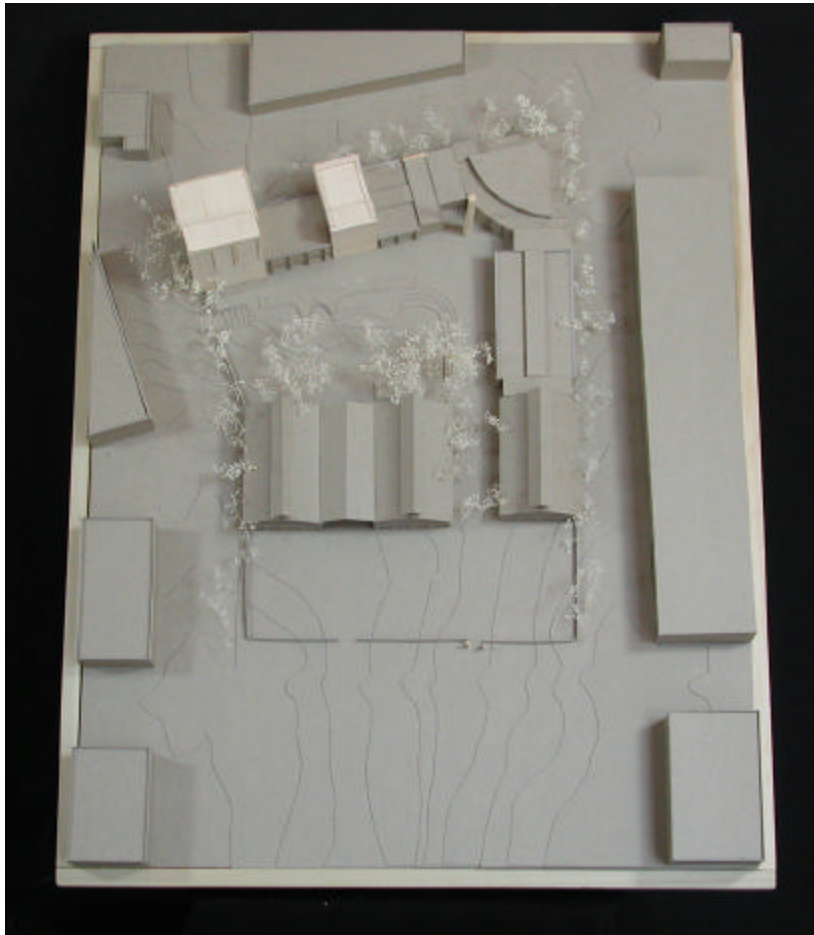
Site model from above. Existing buildings in wood. North is to the right.
